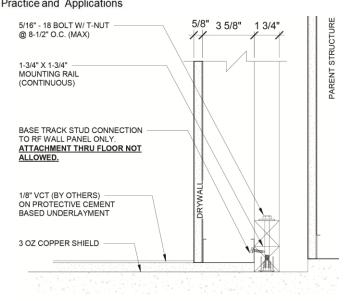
Typical Copper Shielding Panel Floor and Wall Detail.
